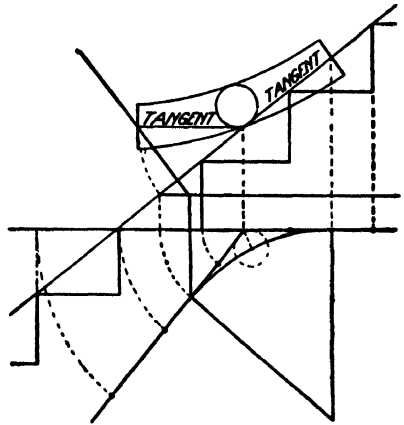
Arrangement of Risers in Obtuse-Angle Plan, Giving Equal Pitch over Tangents and Flights; Face Mold Developed
